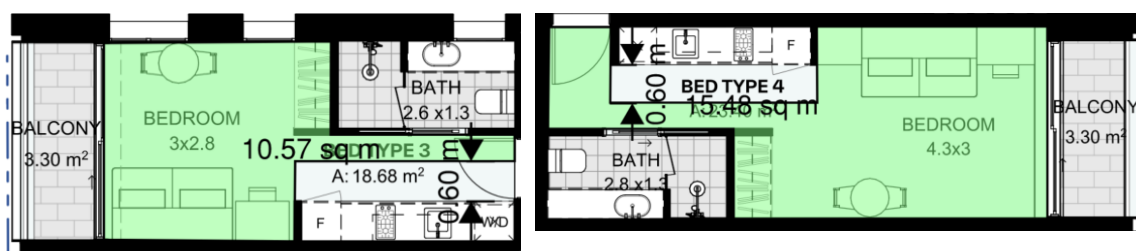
Extract and Council markup of Level 4 floor plan – Room Type 3 (left) and Room Type 4 (right) (Source: PBD Architects and Council Officer markup)
